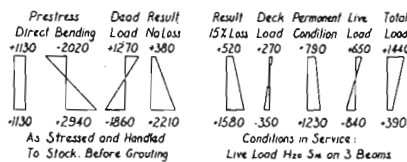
Concrete stresses in beams—lb./sq. in.
